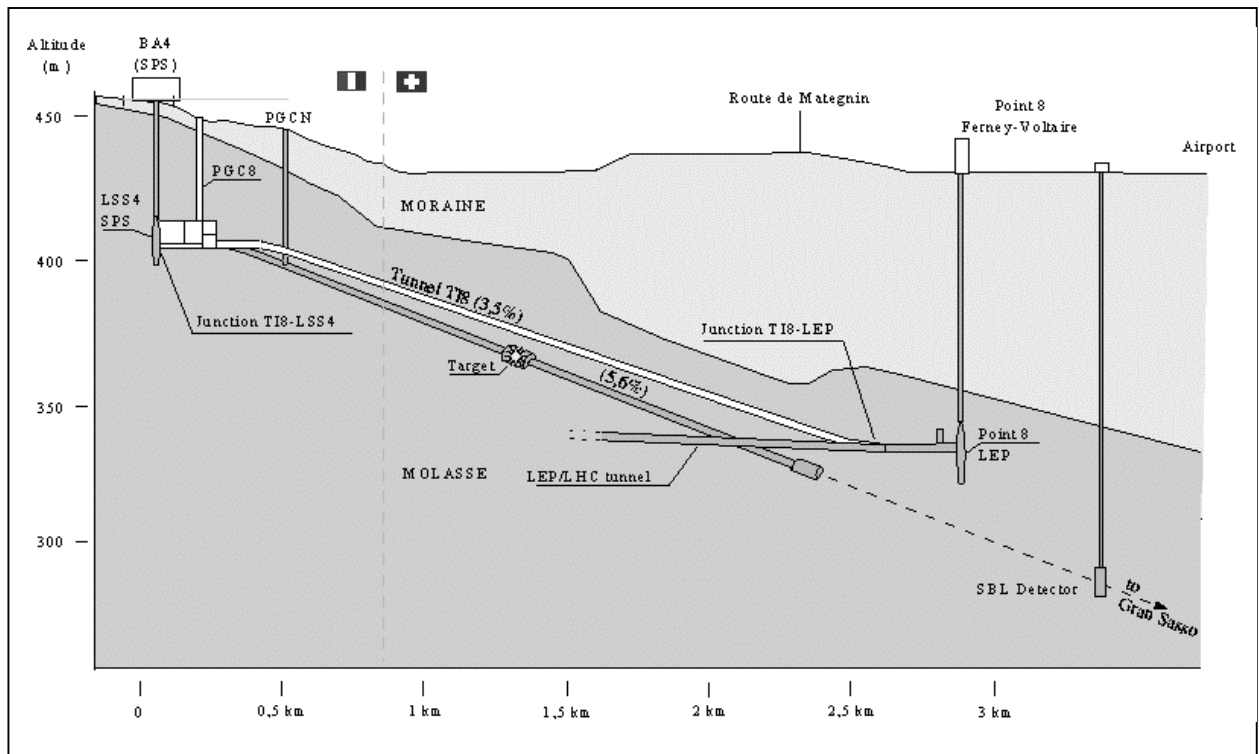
Vertical cut of the proposed NGS layout at CERN.
